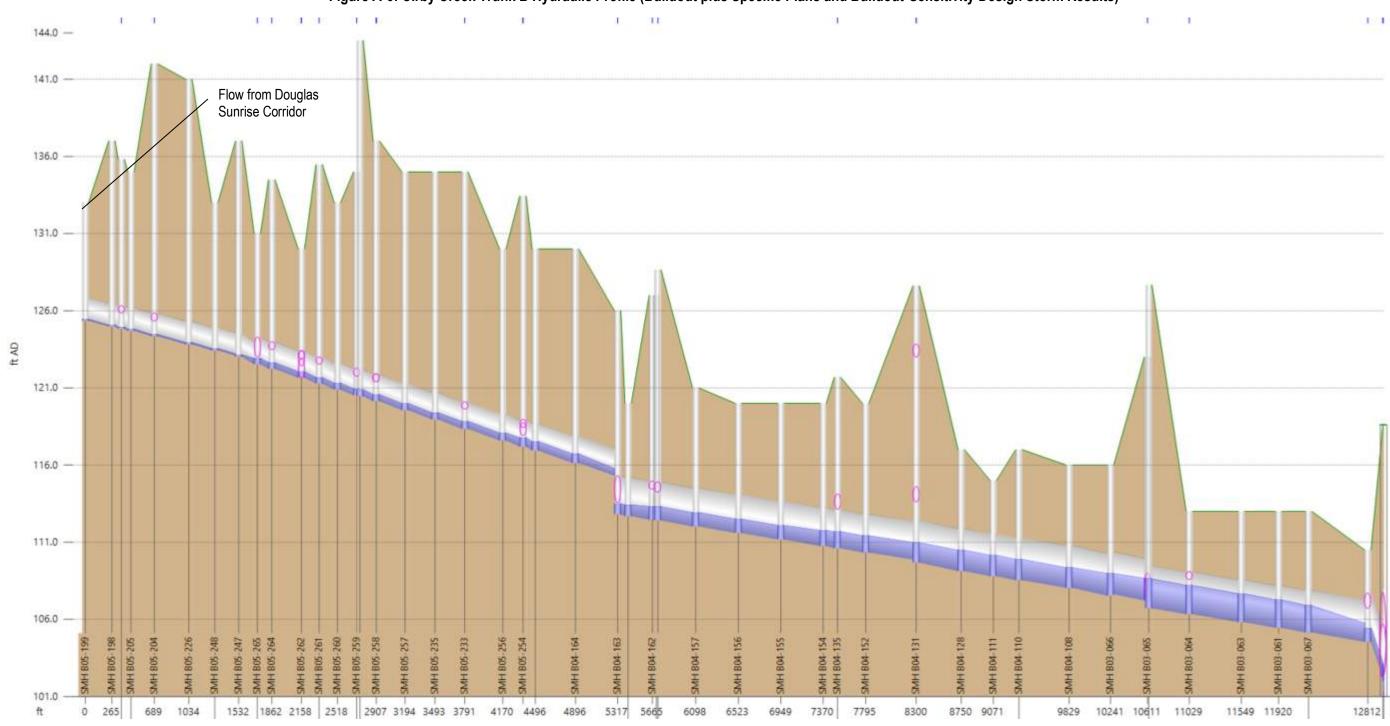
Cirby Creek Trunk B Hydraulic Profile (Buildout plus Specific Plans and Buildout-Sensitivity Design Storm Results)
